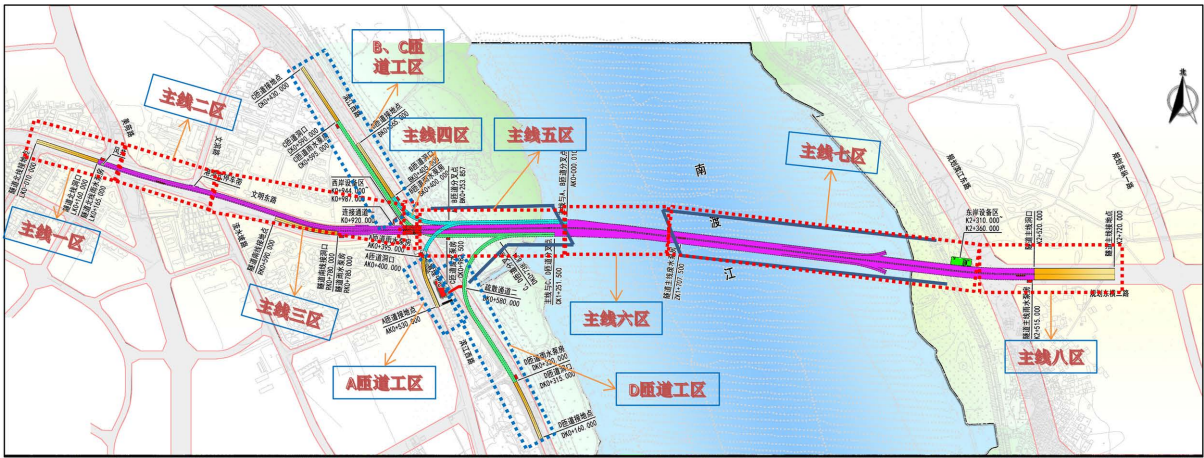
Zoning plan of foundation pit for Haikou Wenmingdong River-crossing passage
